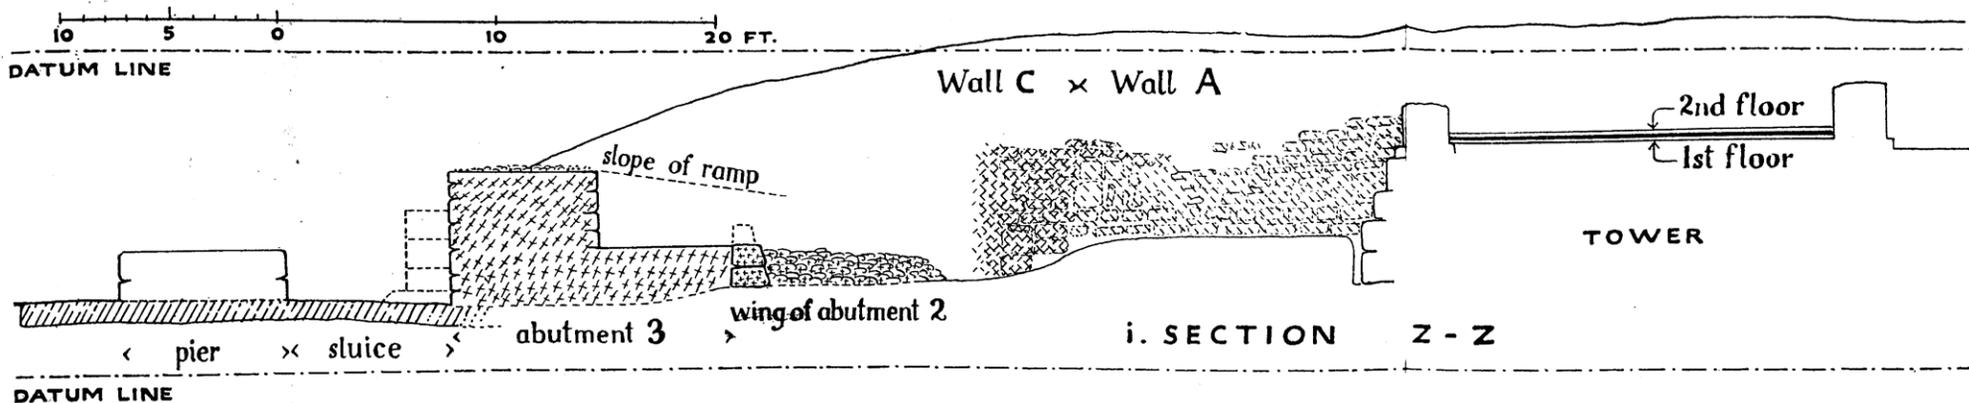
BRIDGE ELEVATIONS AND SECTIONS.
